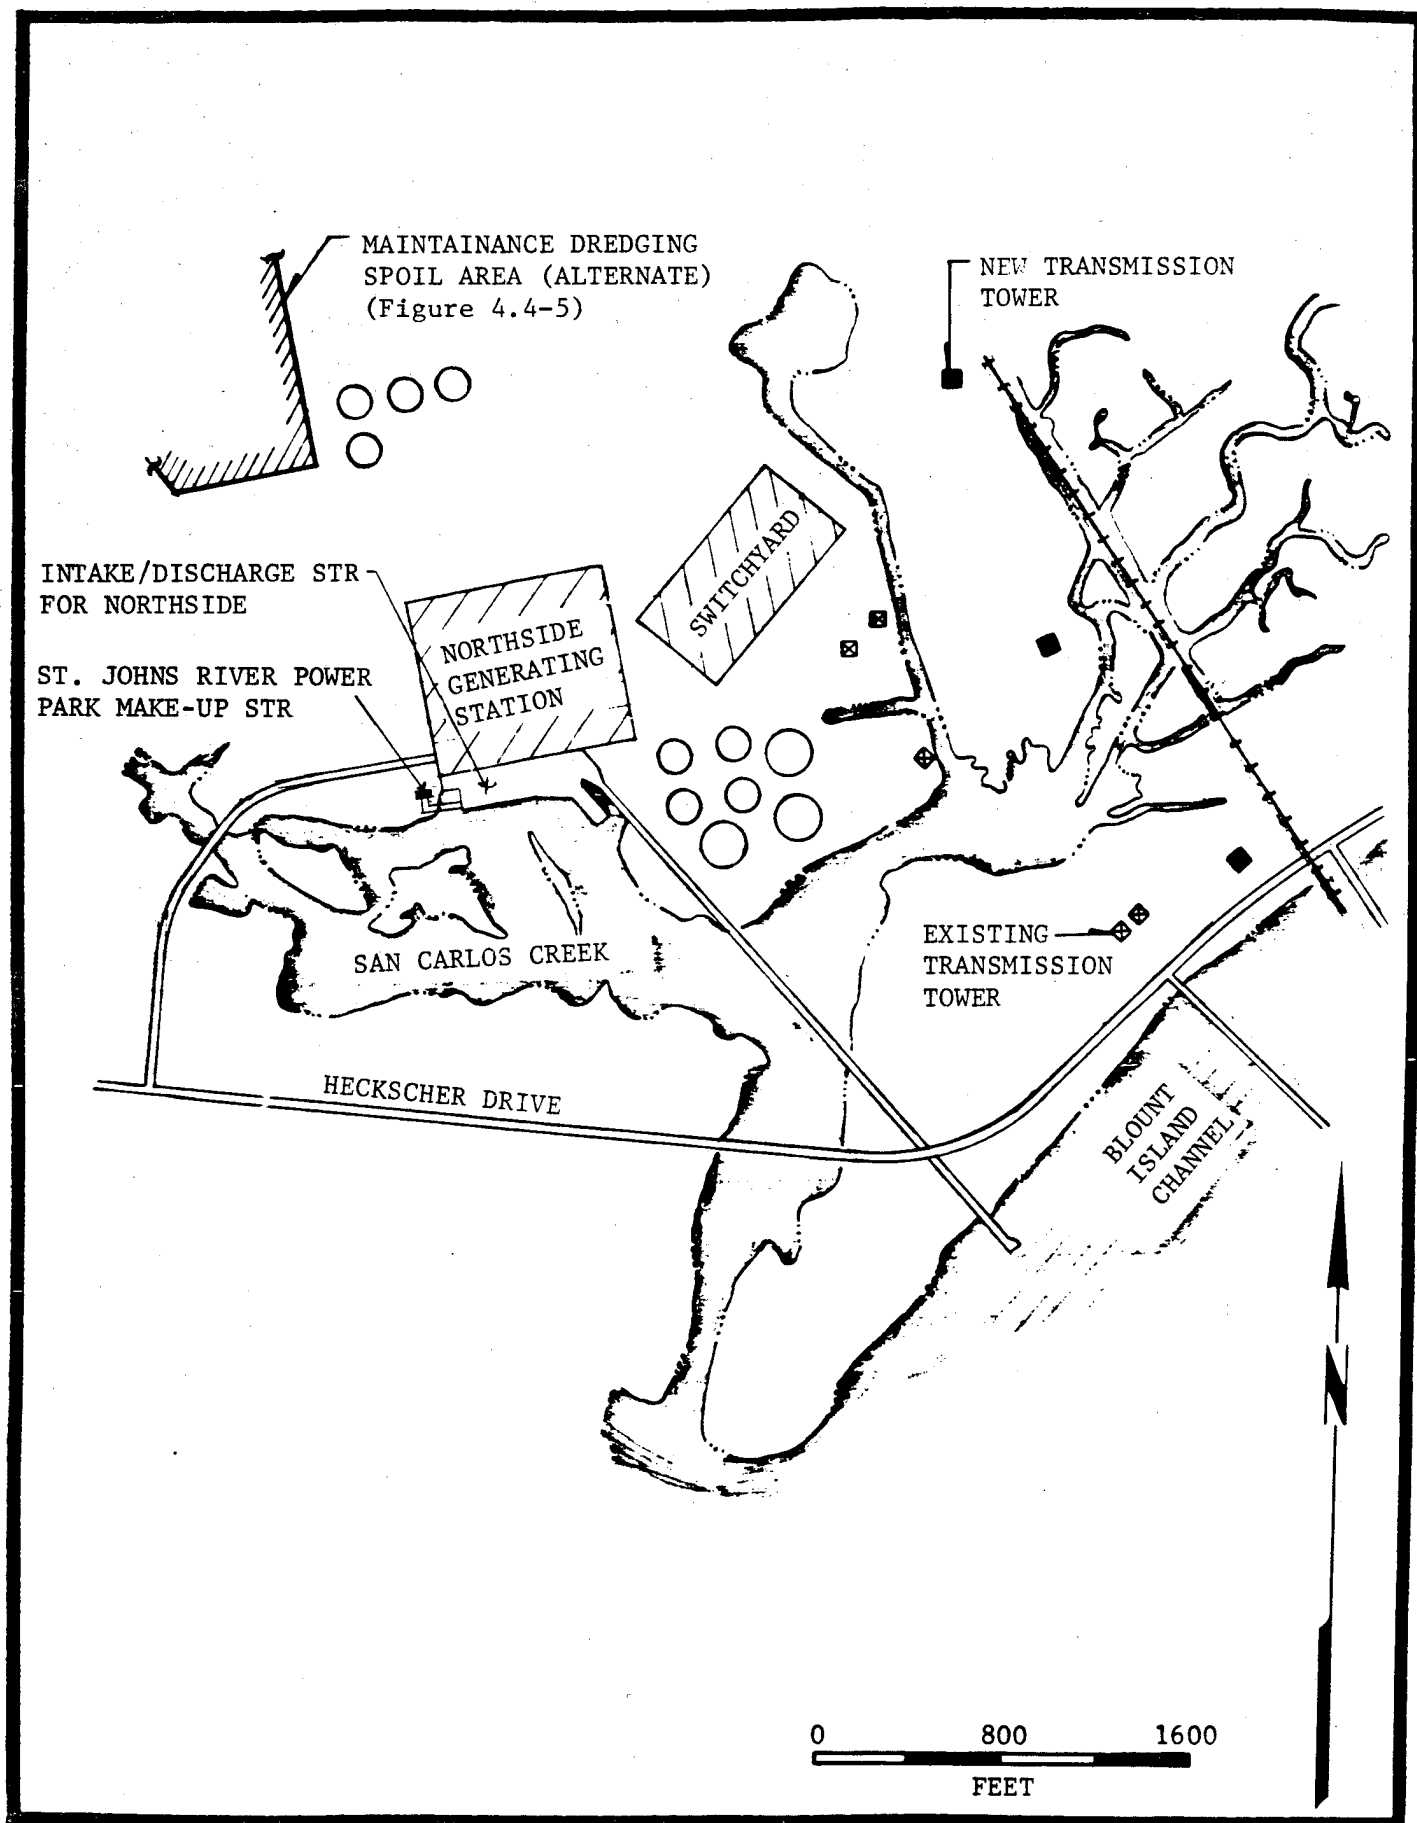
Approximate Tower Placement Adjacent to Northside Station
